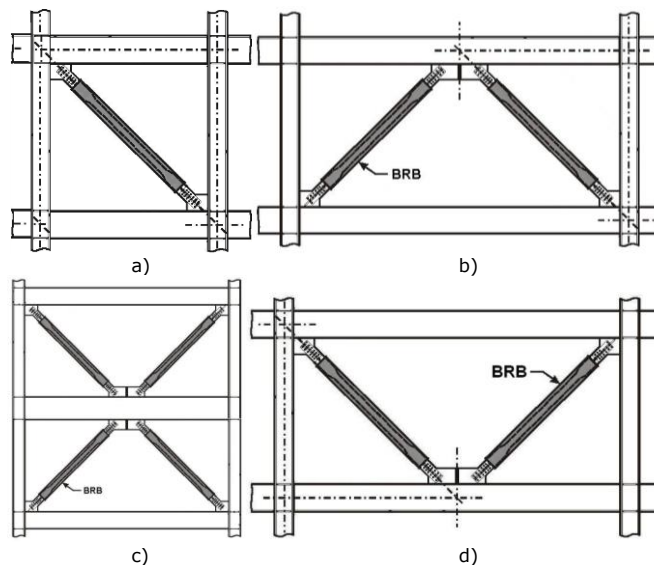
Examples of BRB bracing configurations, (a) Diagonal bracing, (b) Chevron bracing, (c) V bracing, (d) X bracing [9]
